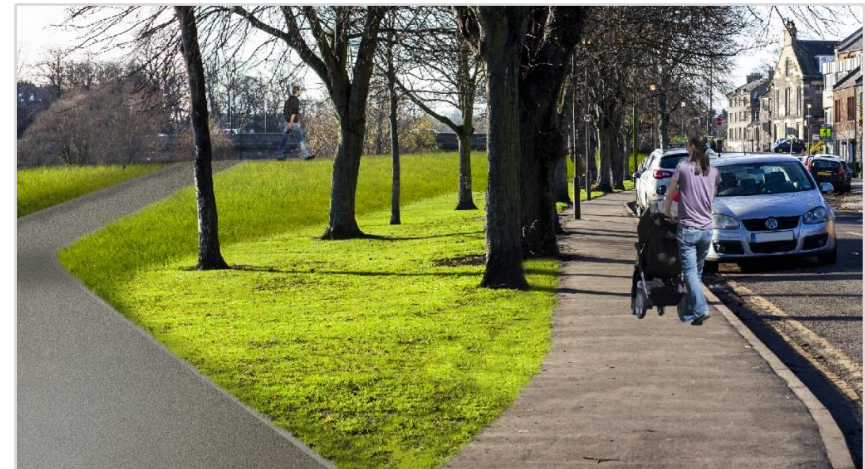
Photomontage of a ramp, raised walkway and embankment at Eskside West (looking southwest)
